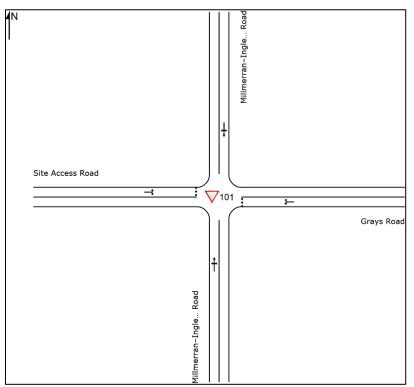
Proposed Configuration of the Millmerran–Inglewood Road Site Access Intersection
